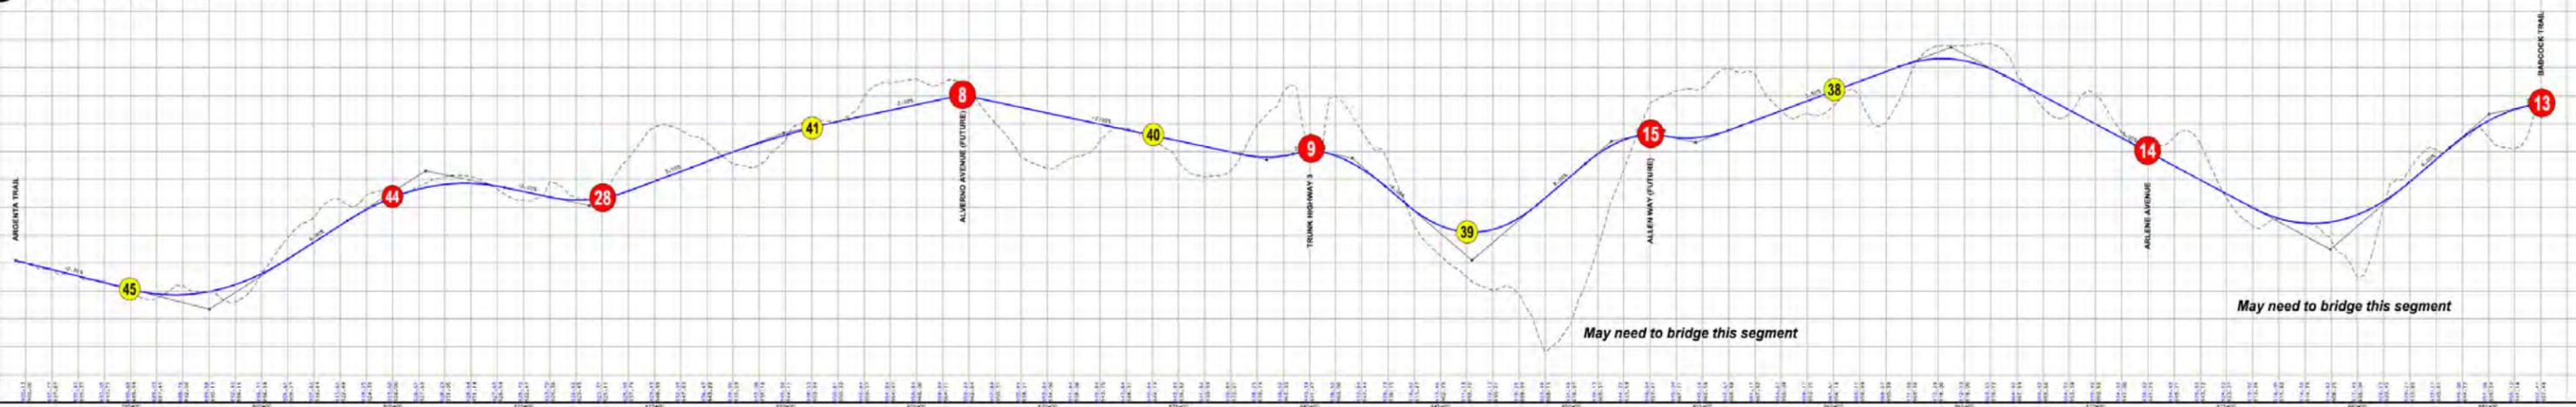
Recommended Collector Roadway System with Potential Access Locations
